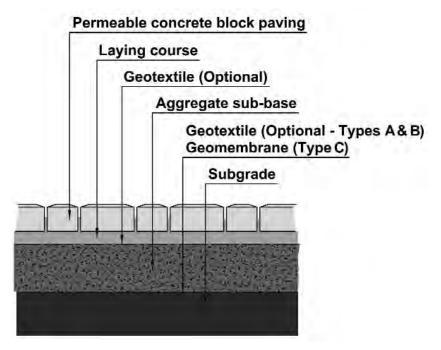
Permeable concrete block pavement (adapted from Pratt et al, 2001)
